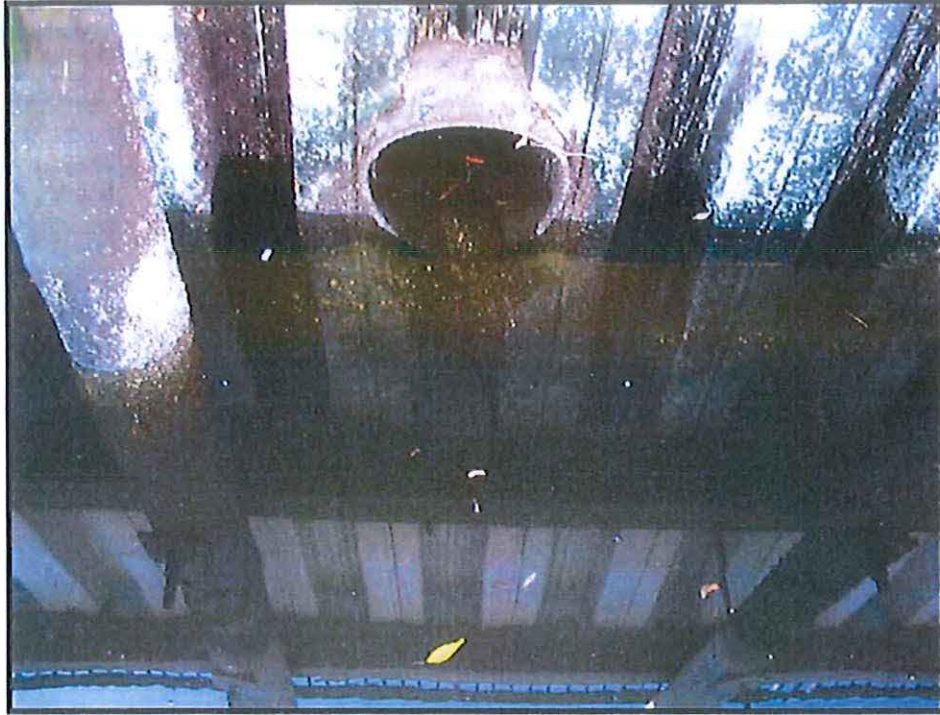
Note loss of soil from around the 12" drain pipe.
